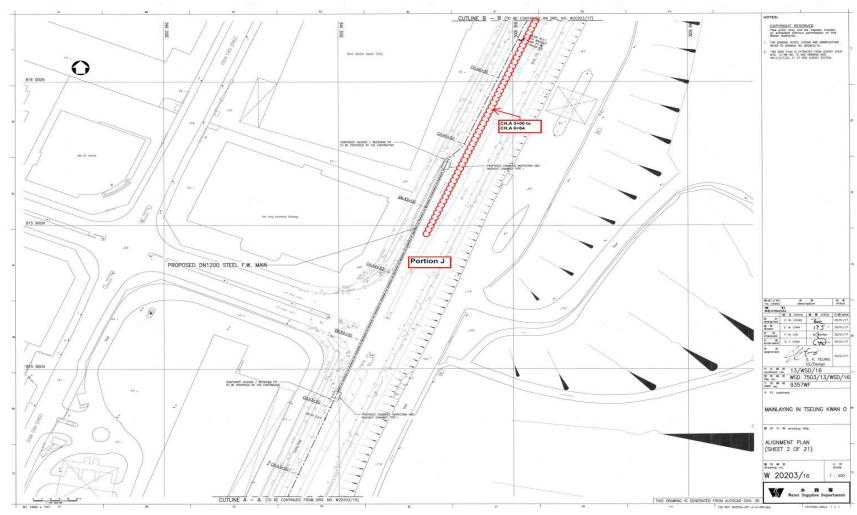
Location Plan for Portion J - CH.A 5+00 to CH.A 6+64
